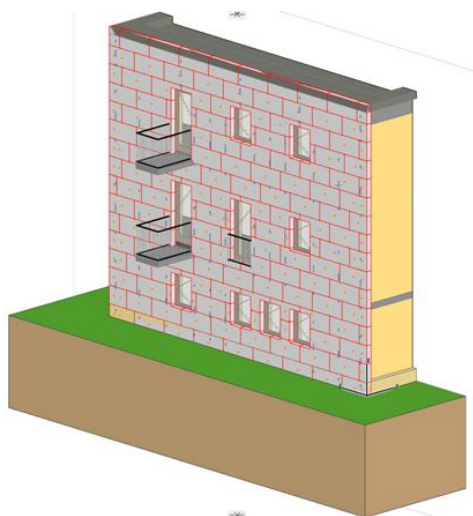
BIM model of the façade of the office building, modelled in Archicad 25
